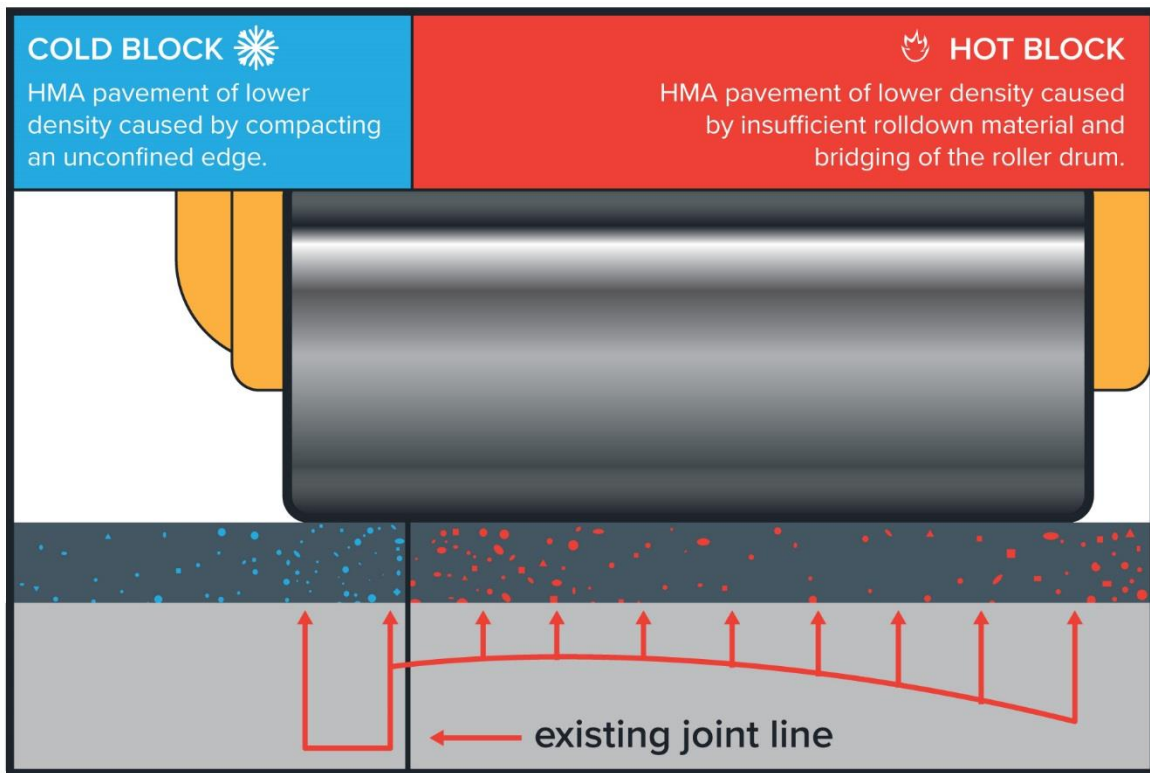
Illustration of bridging forces acting on a steel wheel roller and typical geometric alignment of HMA mixtures on a stacked LJ.
